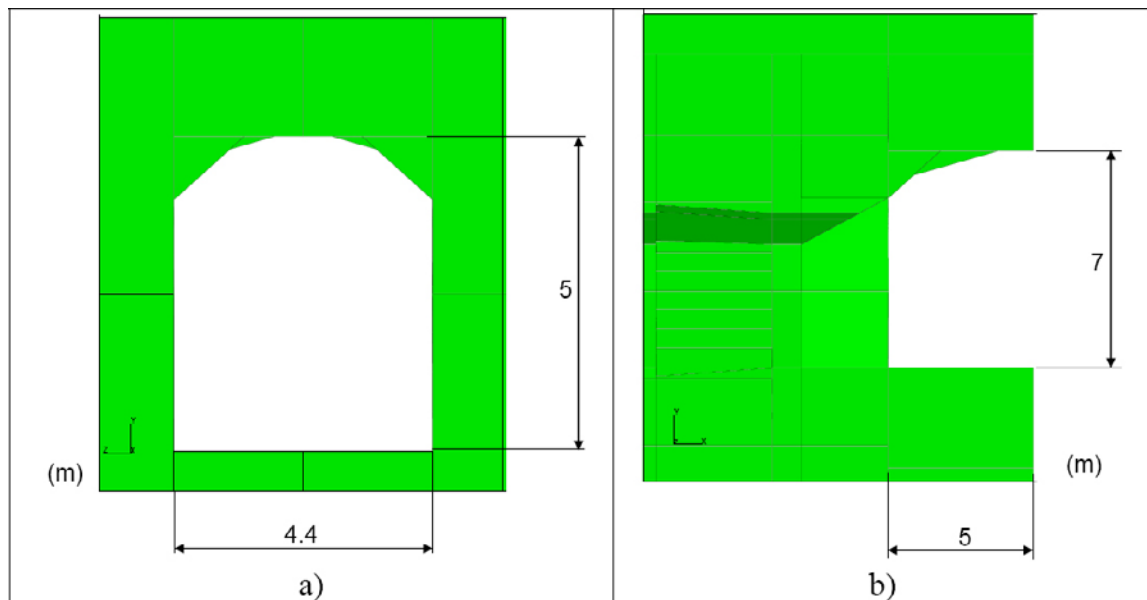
Vertical sections showing the dimensions of a) the deposition tunnel and of b) the main tunnel. The orthogonally oriented planes are construction planes which were used to define the geometry and to facilitate the discretization of the continuum.
